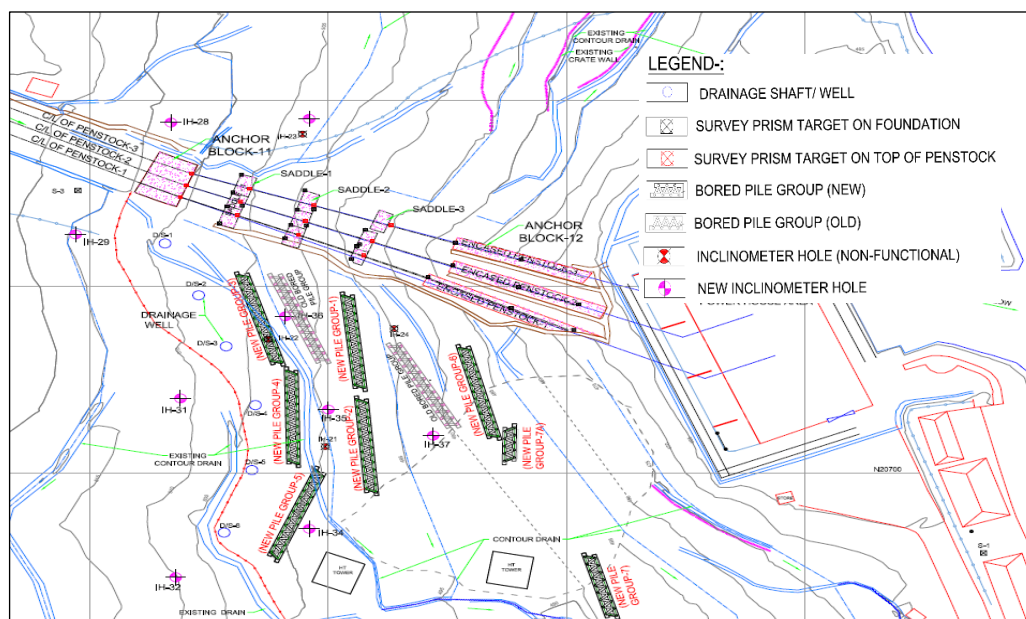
Layout plan of penstock AB-11 to 12 showing the proposed pile groups
